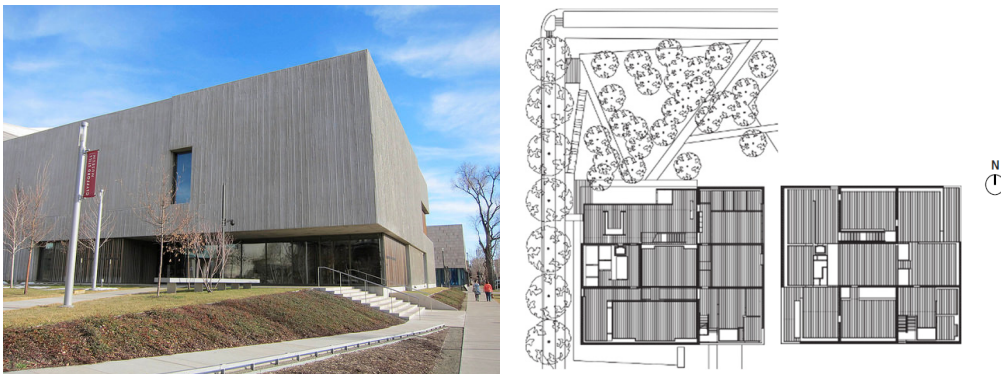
Site and building view looking south (left) and ground and second level plans (right). Source: (Left: Jessica Sheridan 2013; right: Allied Works 2015)
